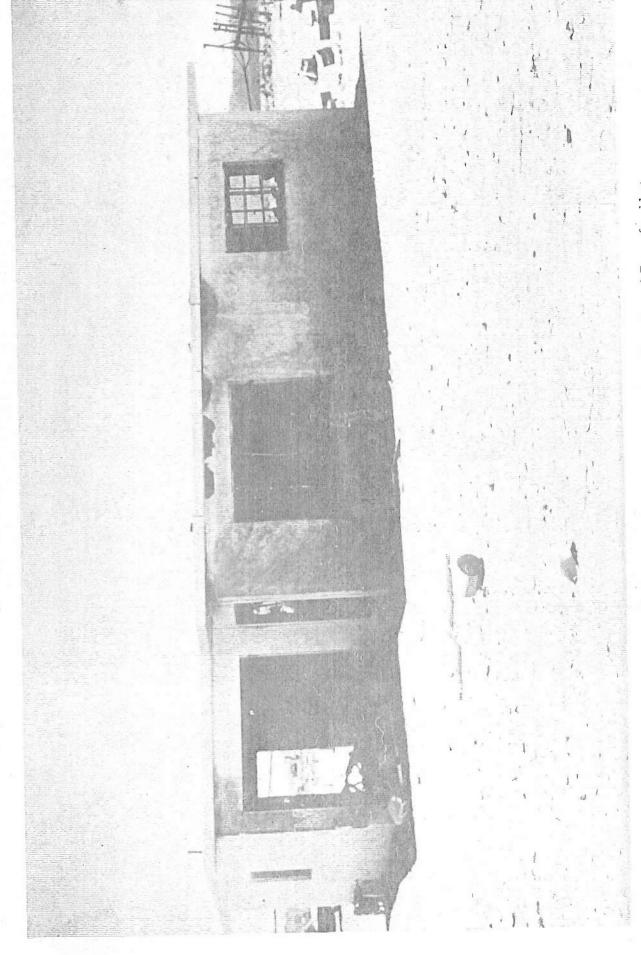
Exterior view of precast concrete house at 4700 ft from Ground Zero after blast.
